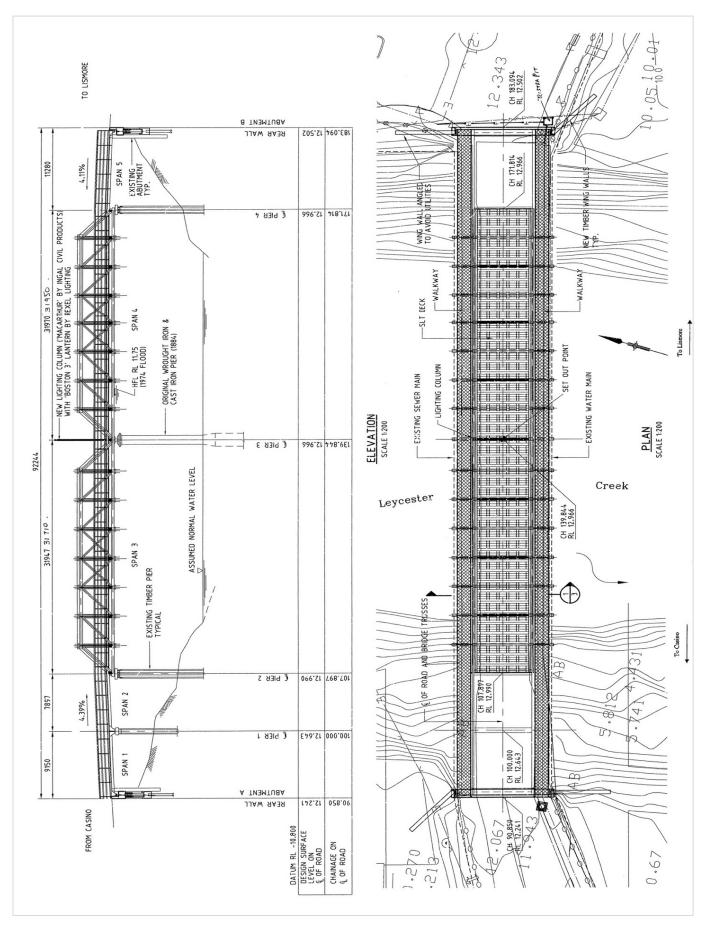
COLEMANS BRIDGE (ELEVATION + PLAN)
